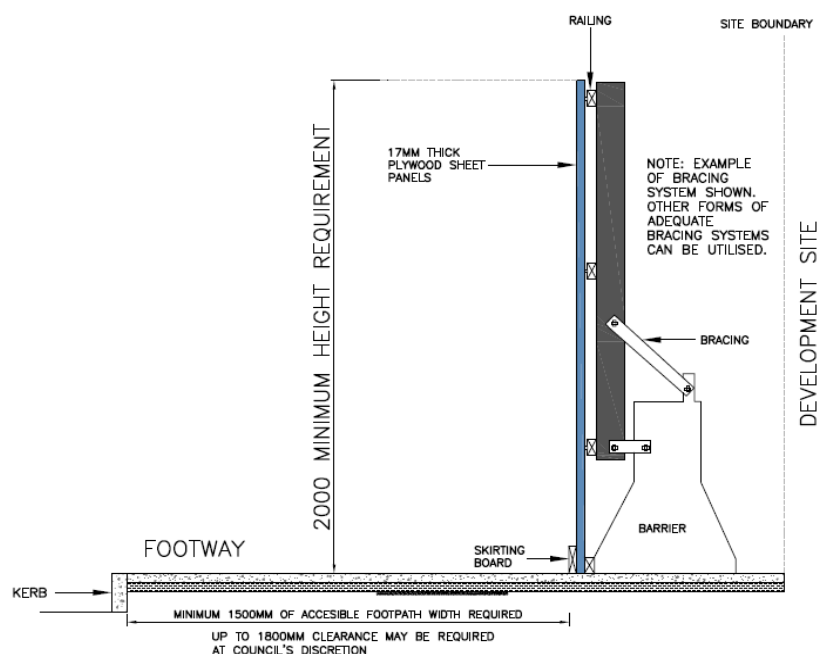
Diagram showing typical Type A Hoarding set up with full width concrete footpath section.
